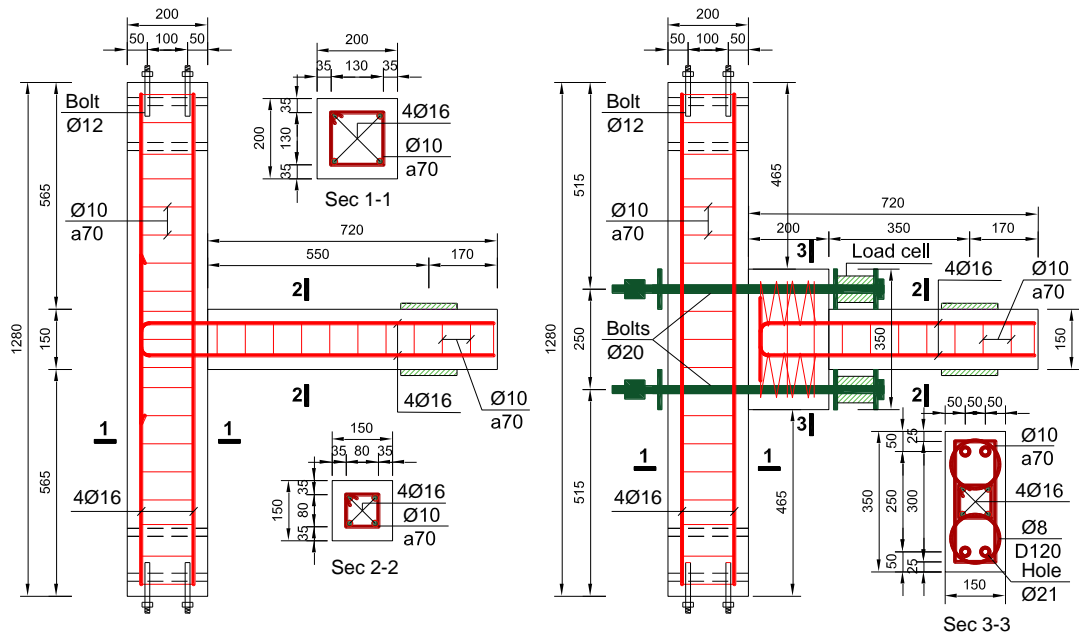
Design of the monolithic and dry precast joints (in millimeter).
